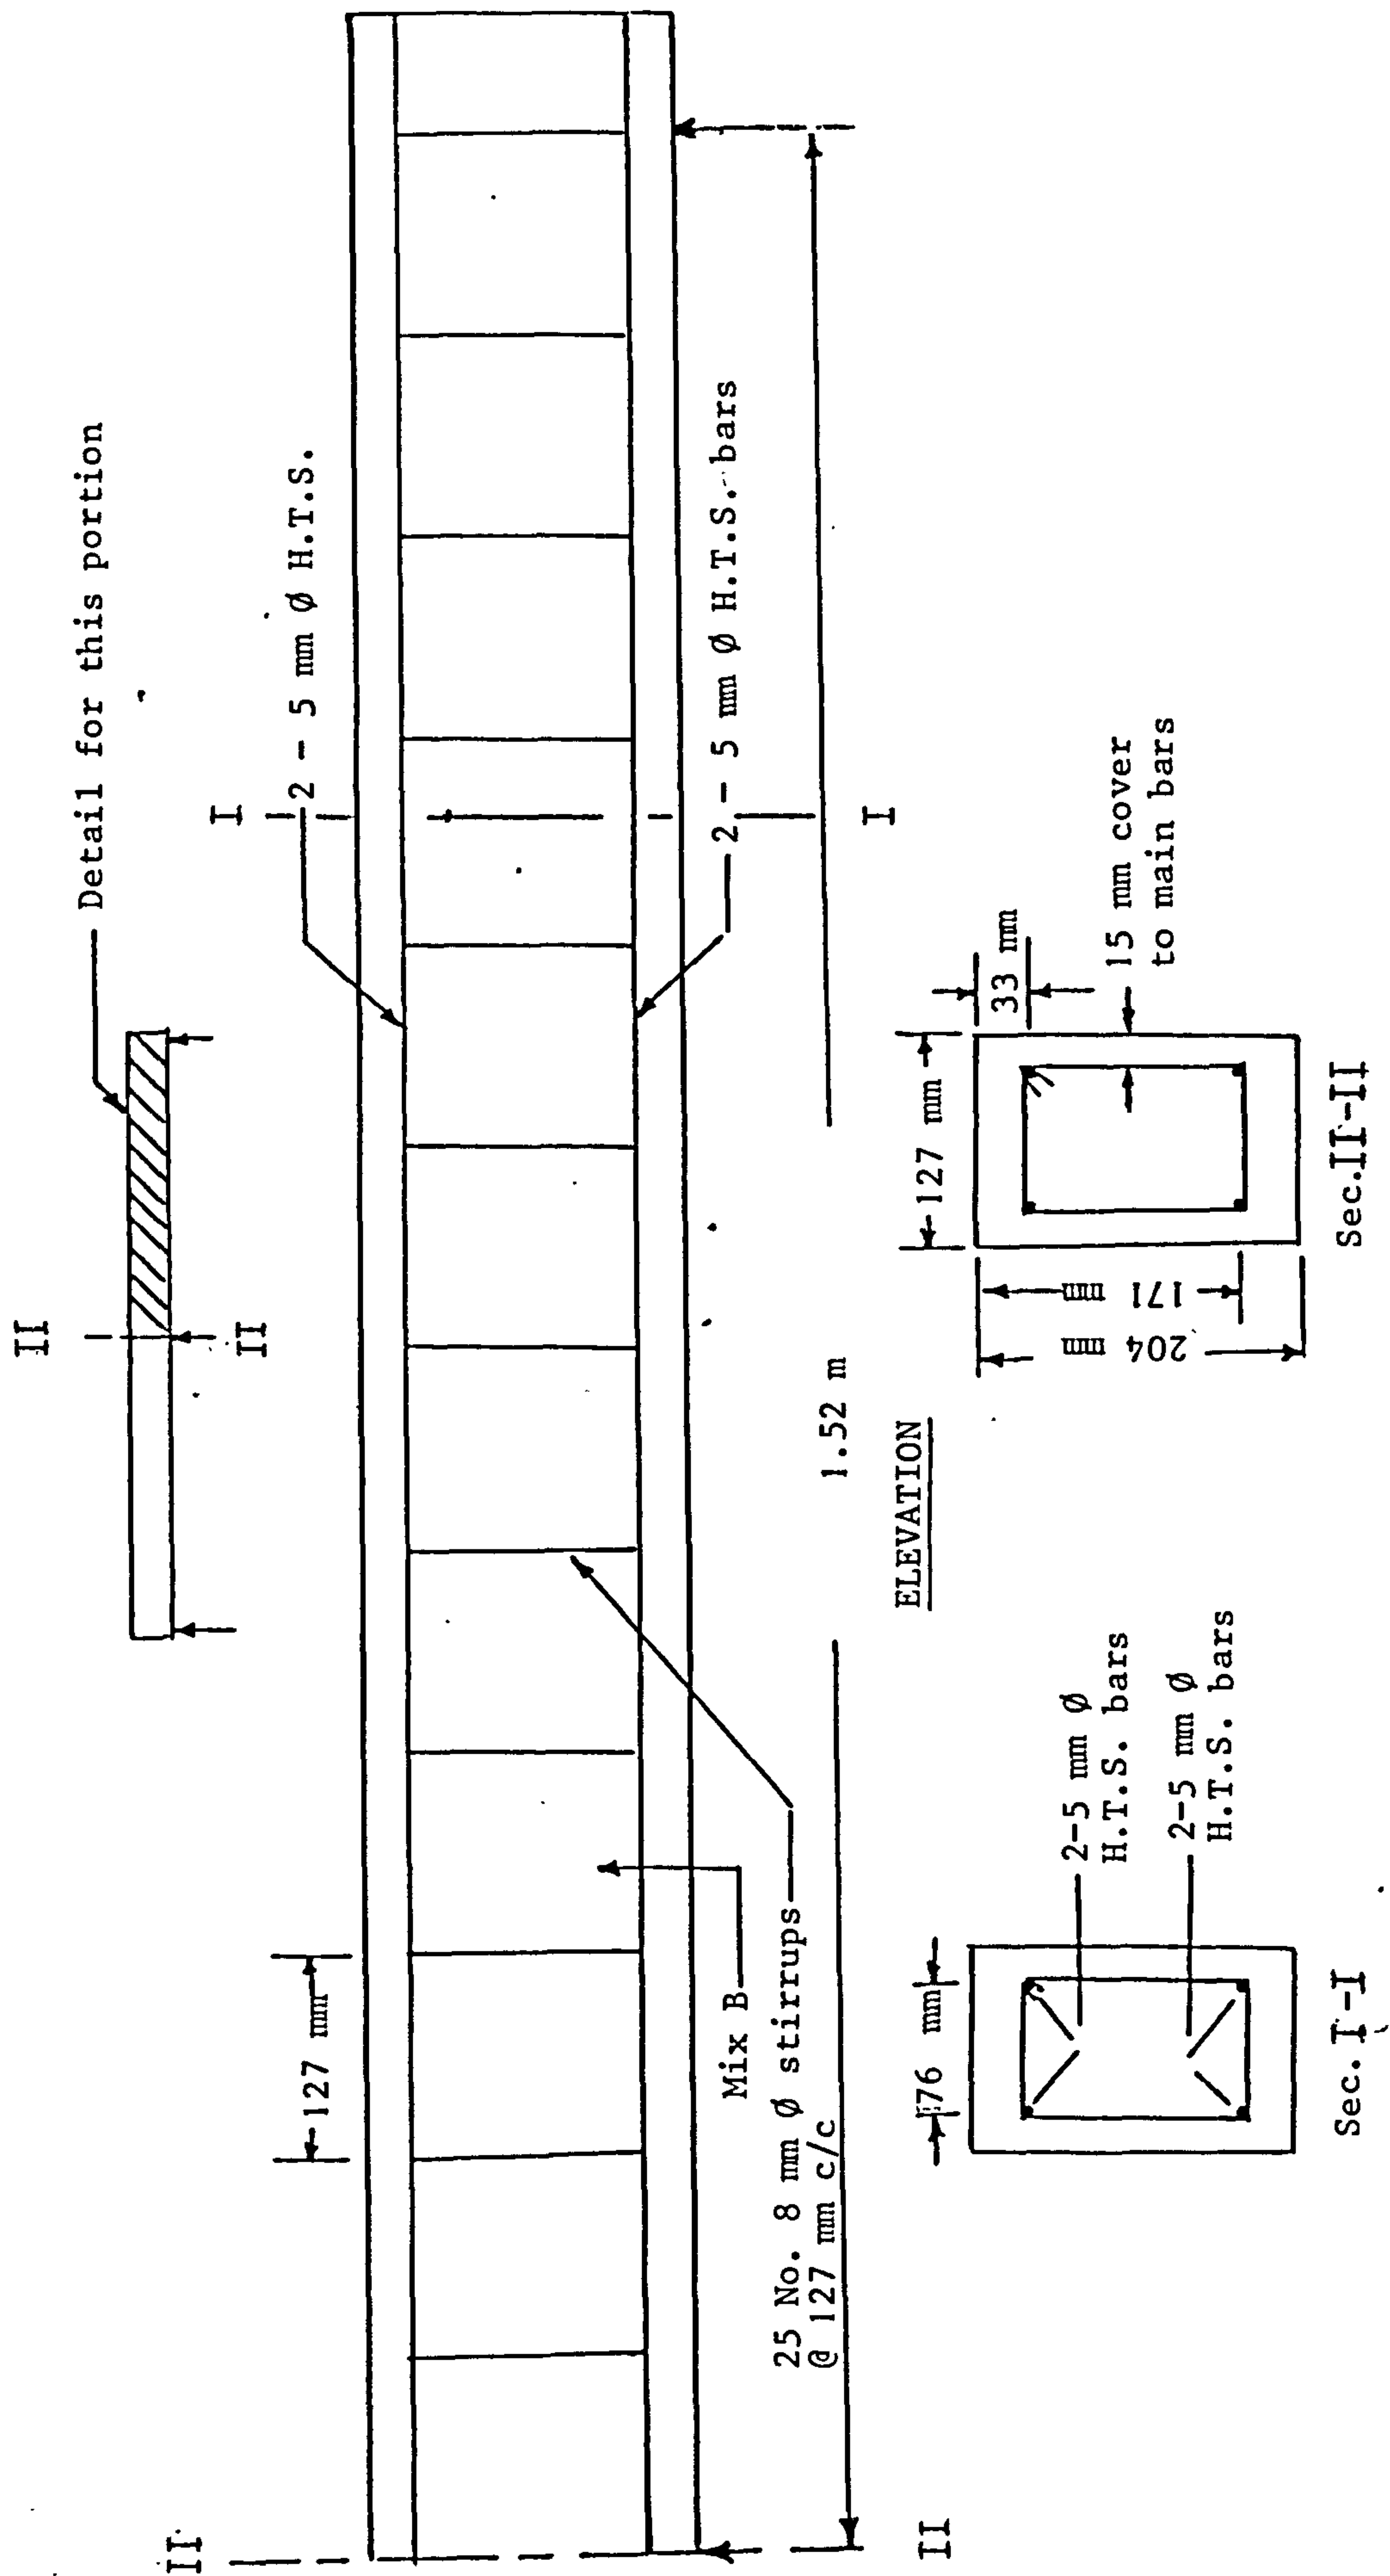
Diagram showing reinforcement in prestressed concrete continuous beam
